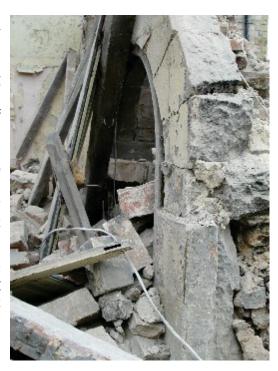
Mechanism above the back boiler (photo reference HHH13J143).
